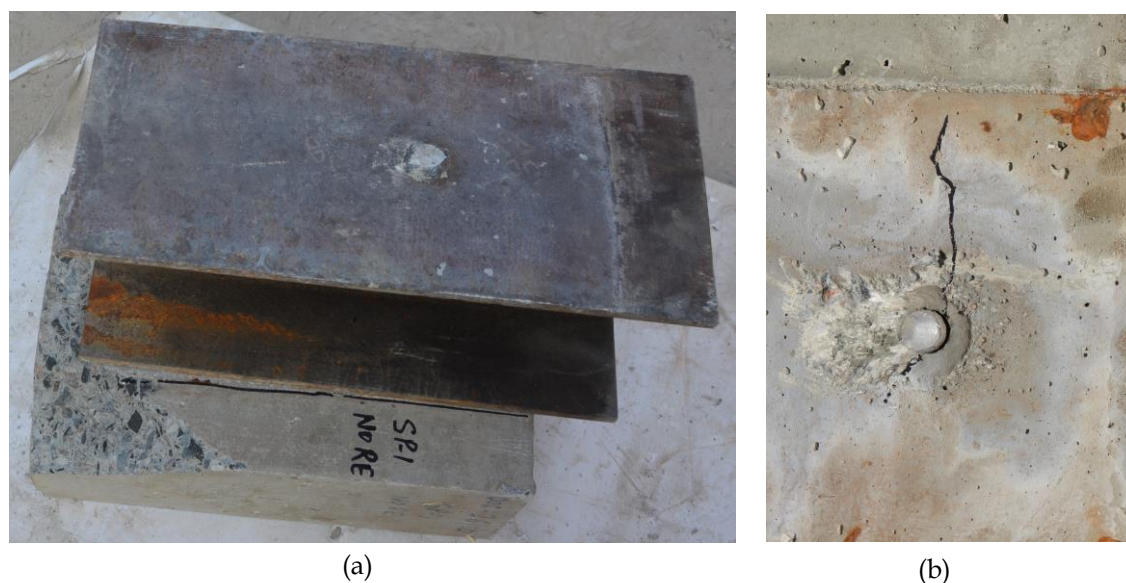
Failure of specimens having unreinforced concrete elements with; (a) overturning of steel-section from original position with respect to concrete element and (b) ripping of concrete from position of stud
